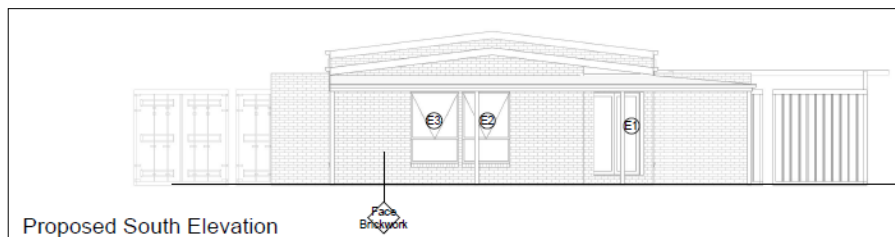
Proposed South Elevation, as viewed from Mt Buller Road
